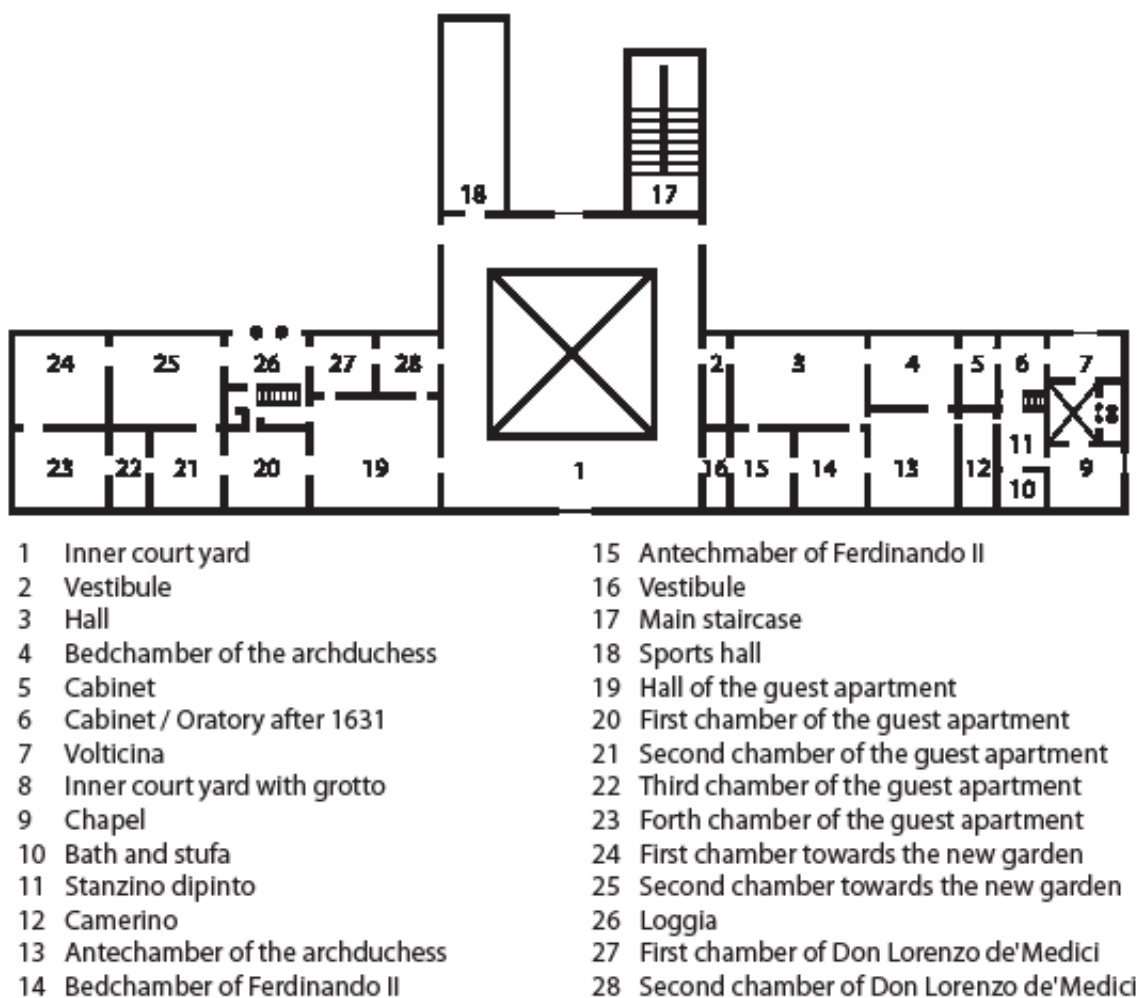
Villa Poggio Imperiale, Florence, Ground-floor plan, reconstruction of 1625.
